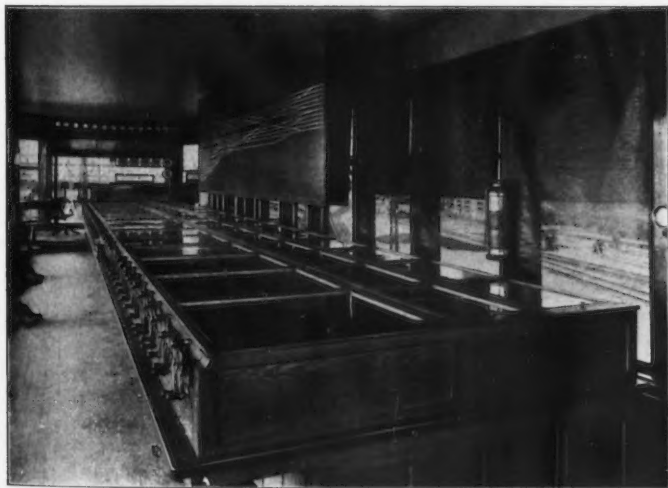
INTERIOR VIEW OF K STREET TOWER.
